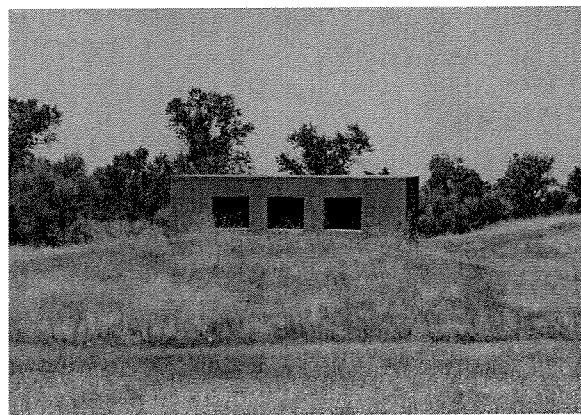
Observation Shelter No. 1 (Unit 126), Beta Test Complex, 1963-1964. Looking southwest. View of May 2005.
